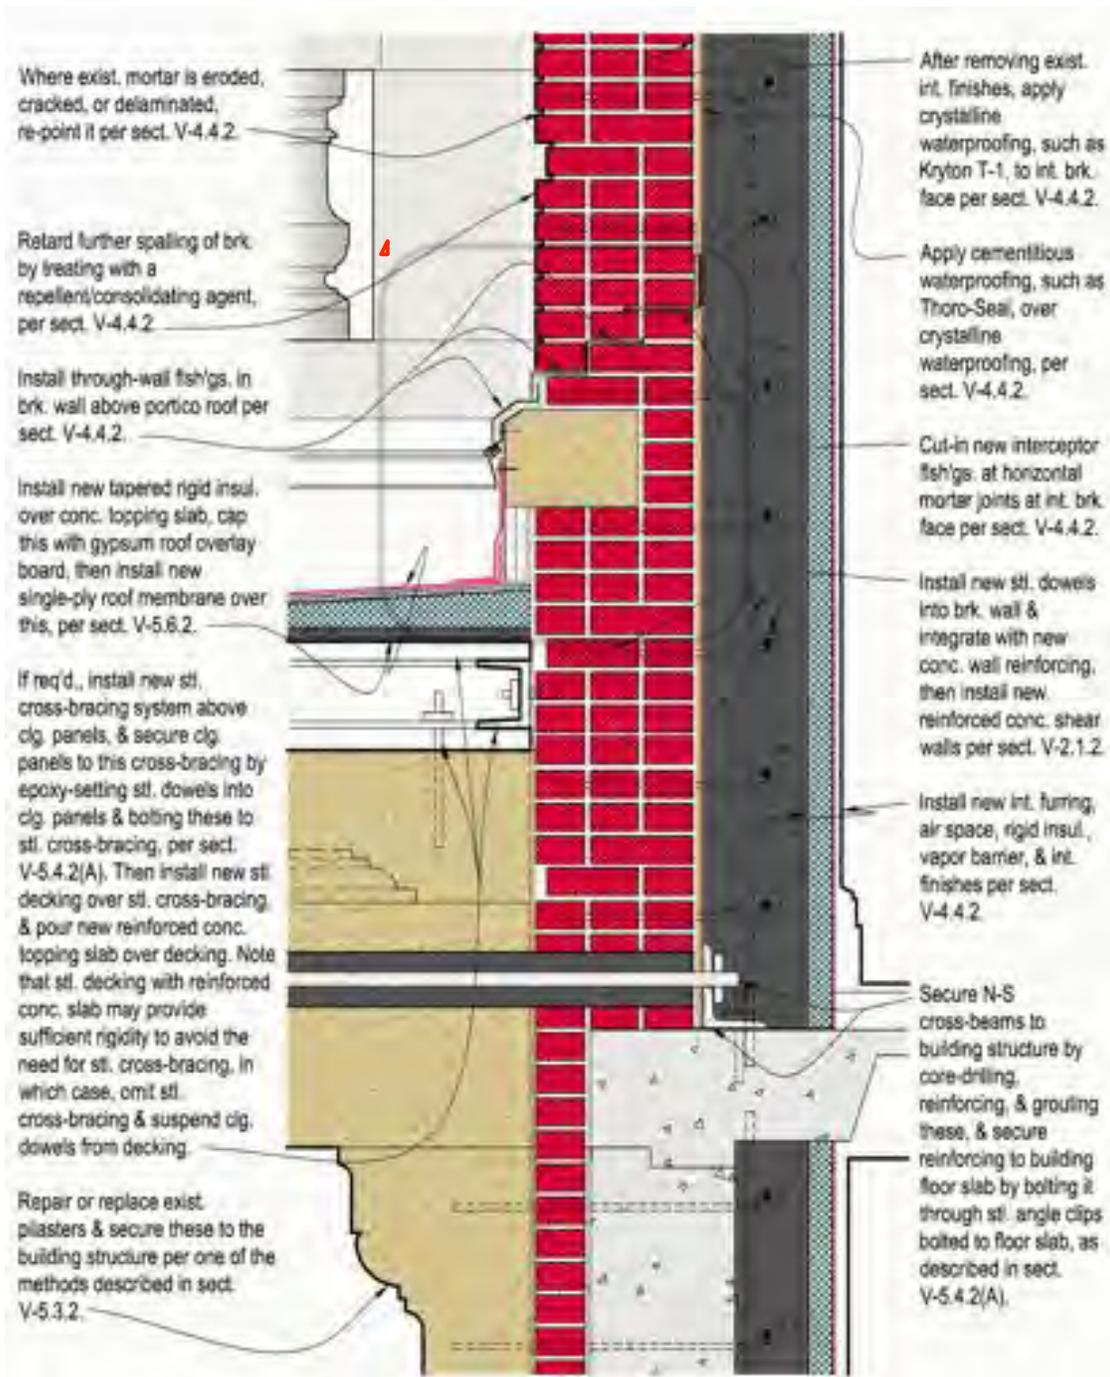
(4): Retrofitting of Through-Wall Flashings Above Portico Roof
